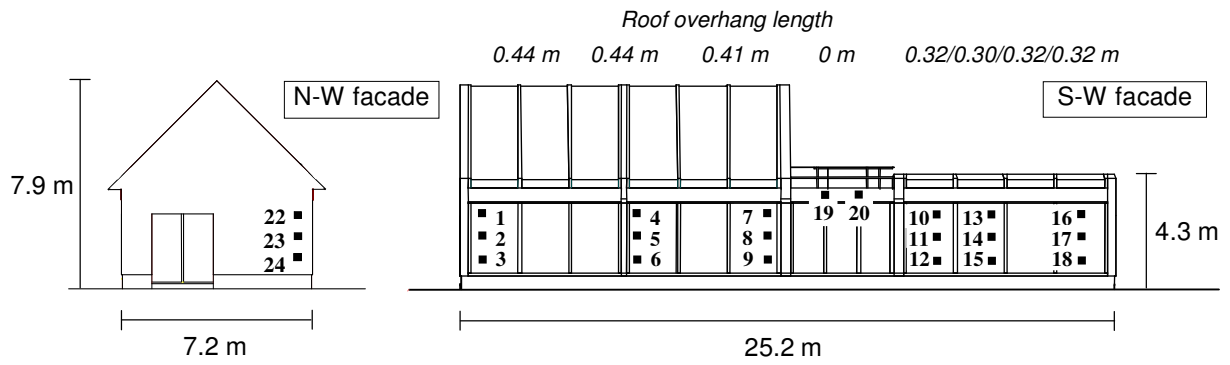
VLIET test building. North-west and south-west facade. The building dimensions, including roof overhang length, and the positions and numbers of the wind-driven rain gauges (indicated by black squares) are indicated.
